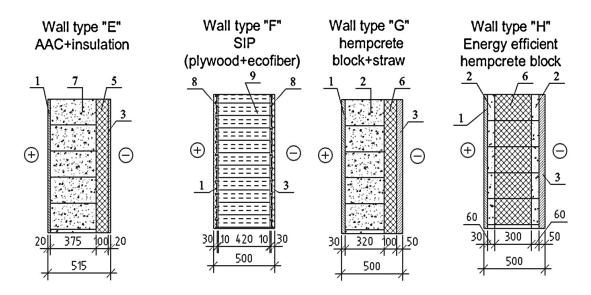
Considered wall types compositions «E»-«H» (1 – internal lime-sand plaster, 2 – hemcrete, 3 – external lime-sand plaster, 4 – honeycomb brick, 5 – mineral wool, 6 – strawbale panel, 7 – autoclaved aerated concrete (AAC), 8 – plywood, 9 – ecofiber)
